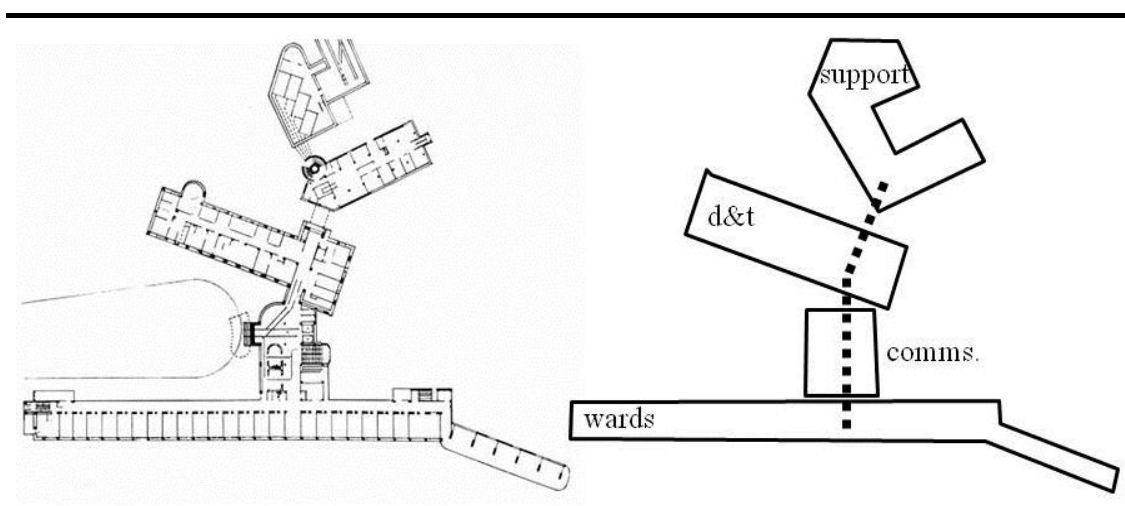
Left: Ground Floor Plan, Paimio Sanatorium, 1929-33 (Gossel&Leuthauser, 1991:186). Right: Author's 1:500 medical planning sketch.
